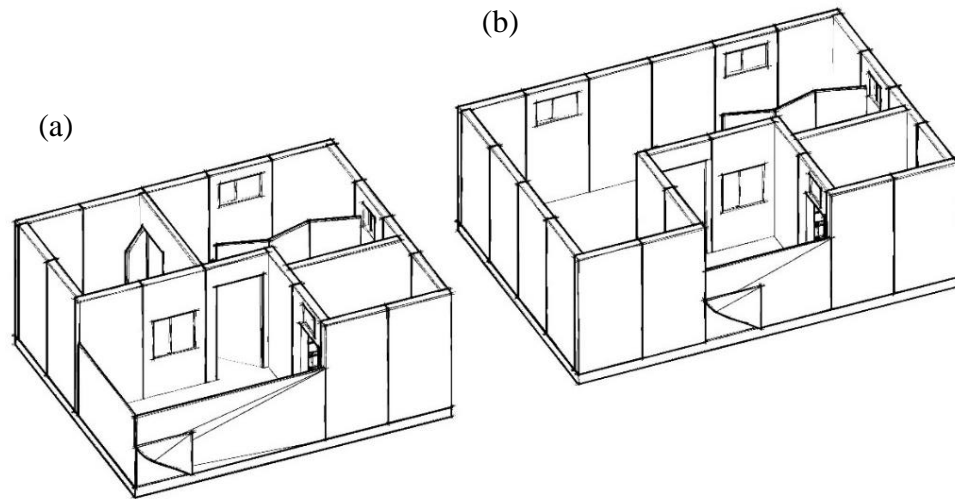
3D sketches illustrating concept 4: a) Basic plan, b) Extended plan
